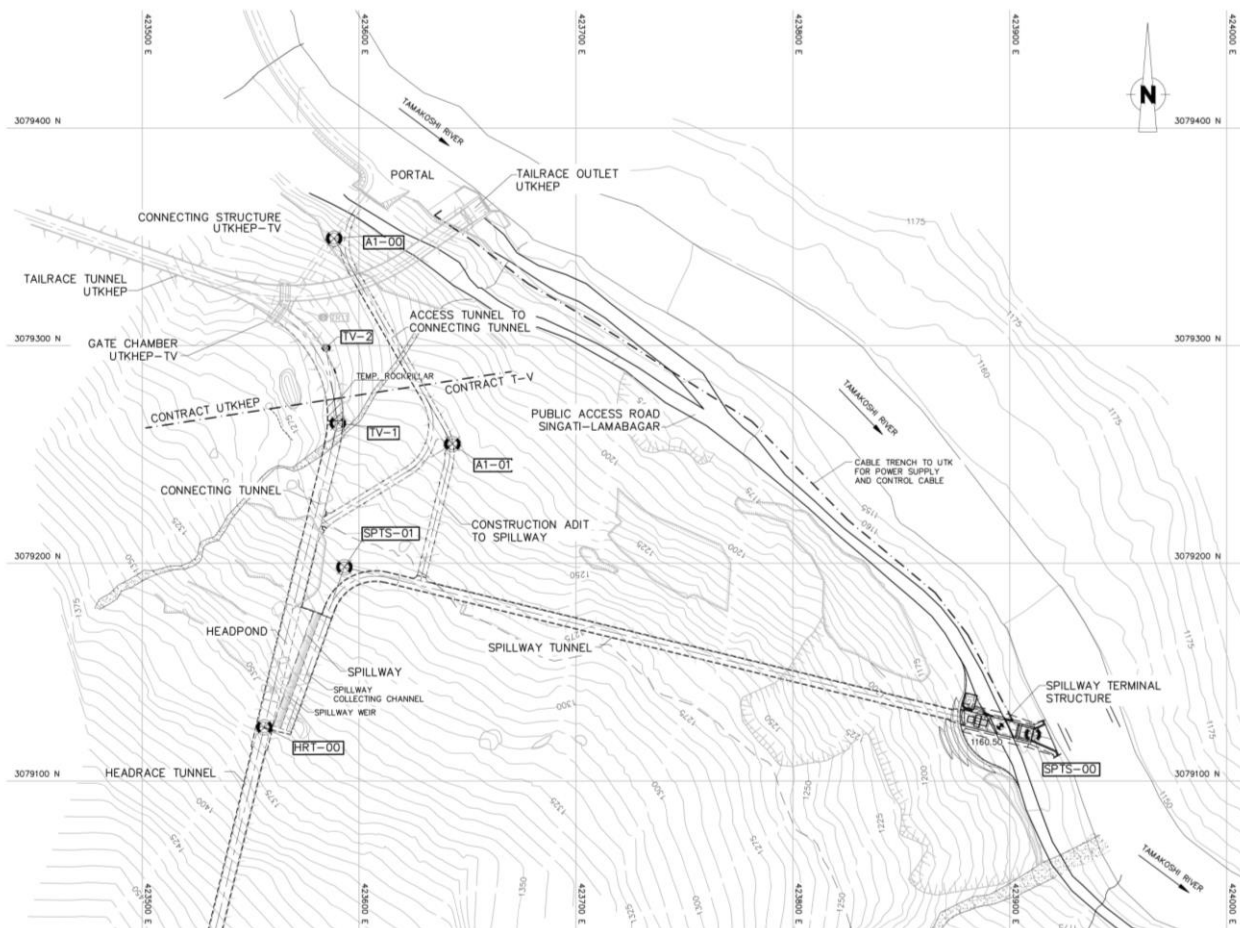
Sketch of the Plan of Headpond and Related Structures
